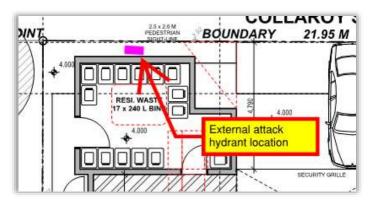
Proposed attack hydrant location (Collaroy Street)
